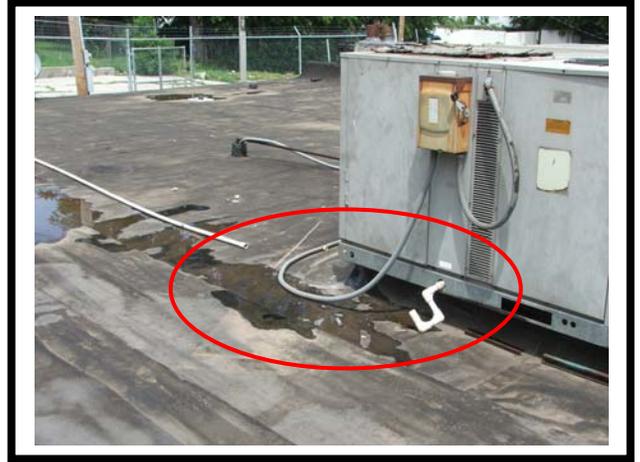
Goodman Heat/Cool Unit on Roof of Mexican Restaurant. Condensate Line is Loose and Leaks onto Roof
